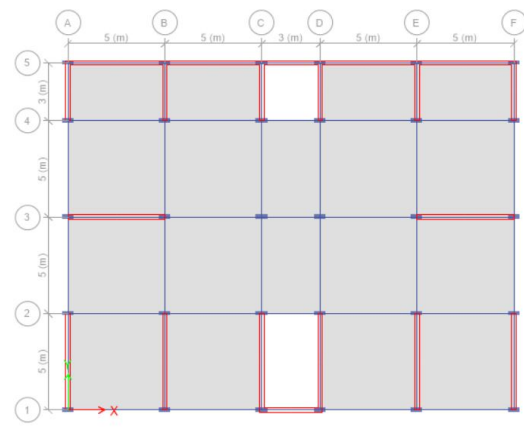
Plan of RCC model with RCC walls at some bays in the ground floor
